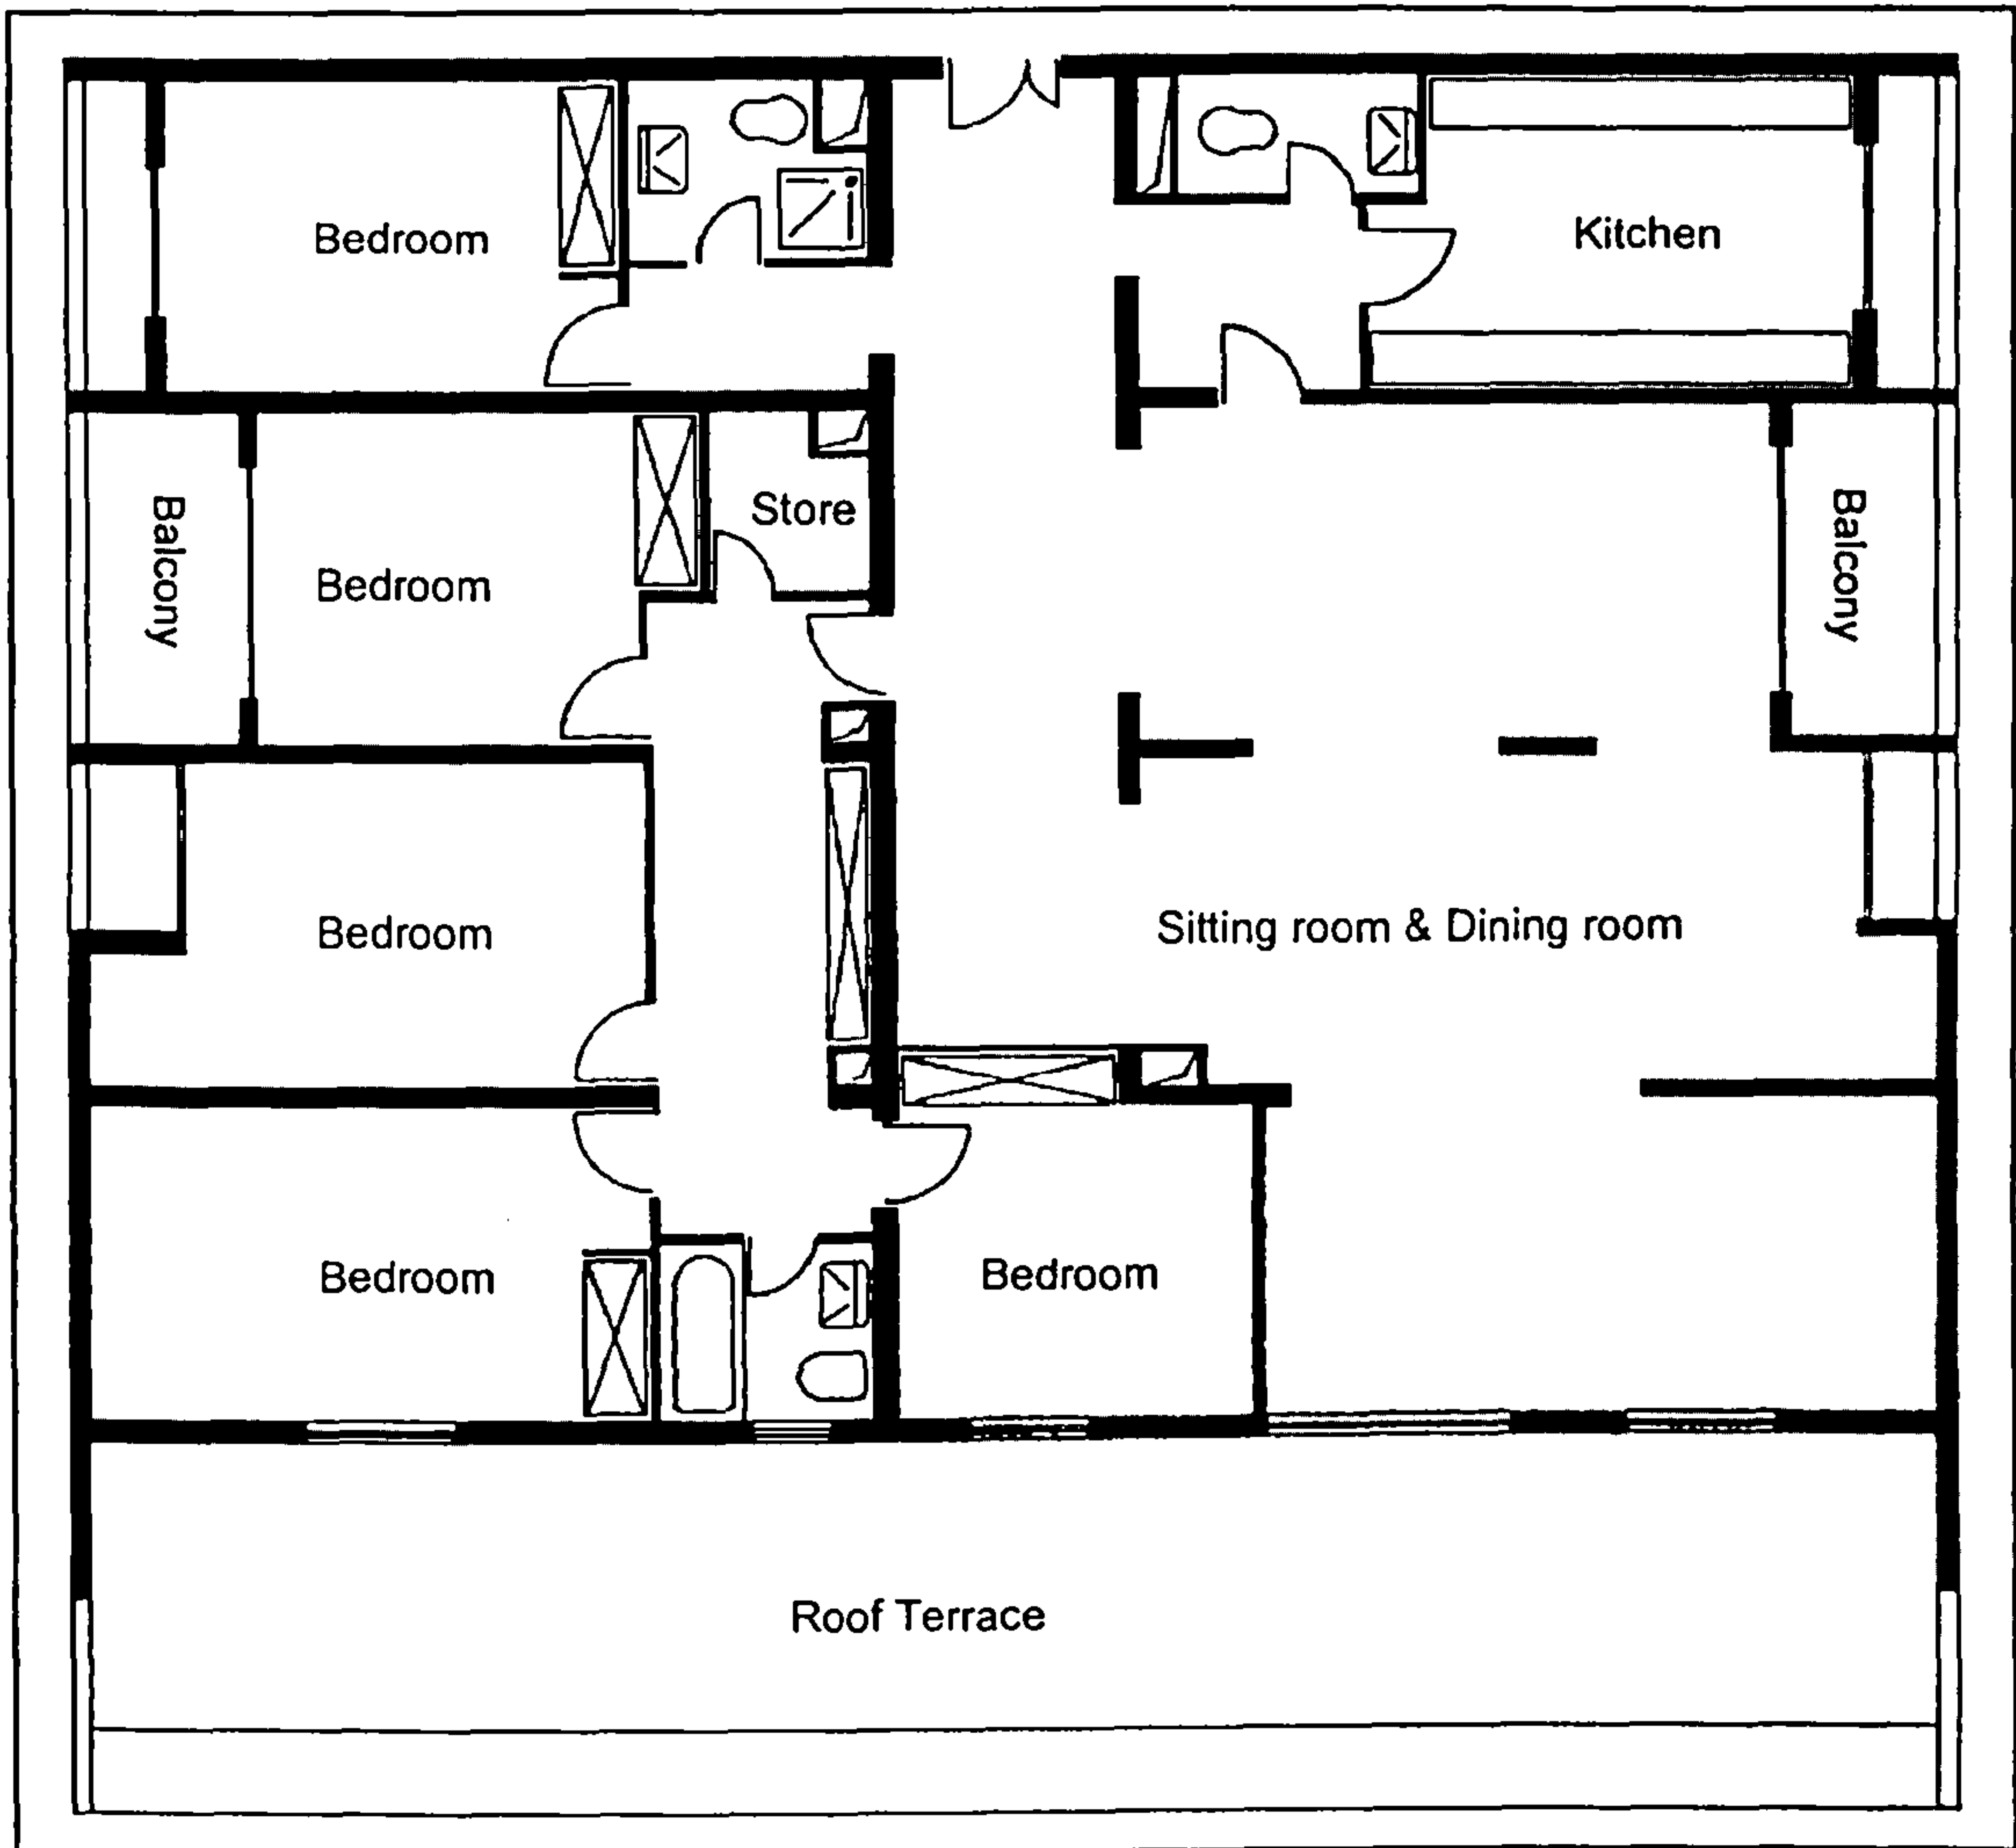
Plan of apartments type A, five-bedroom dwelling unit in Atisaz.
